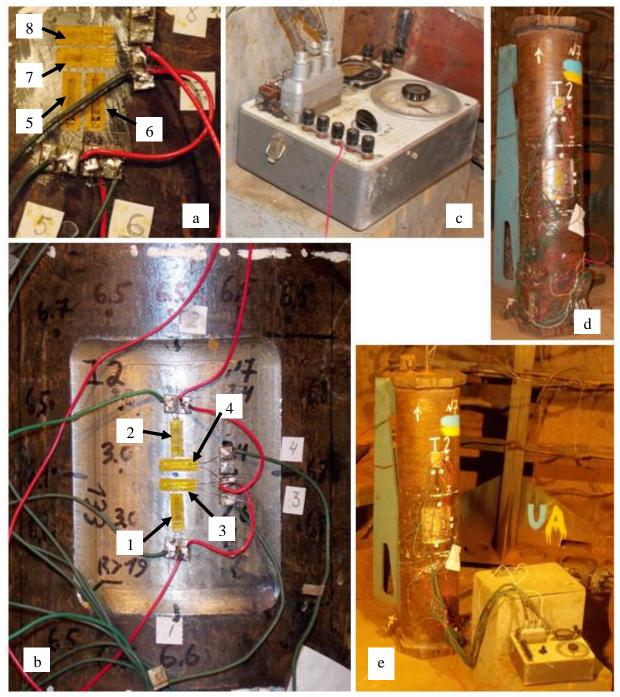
Measurement of specimen I2 strains: a - gauges 5, 6, 7, 8 location; b - gauges 1, 2, 3, 4 location; c - ISD-3 measuring device, d, e - specimen during the test.
